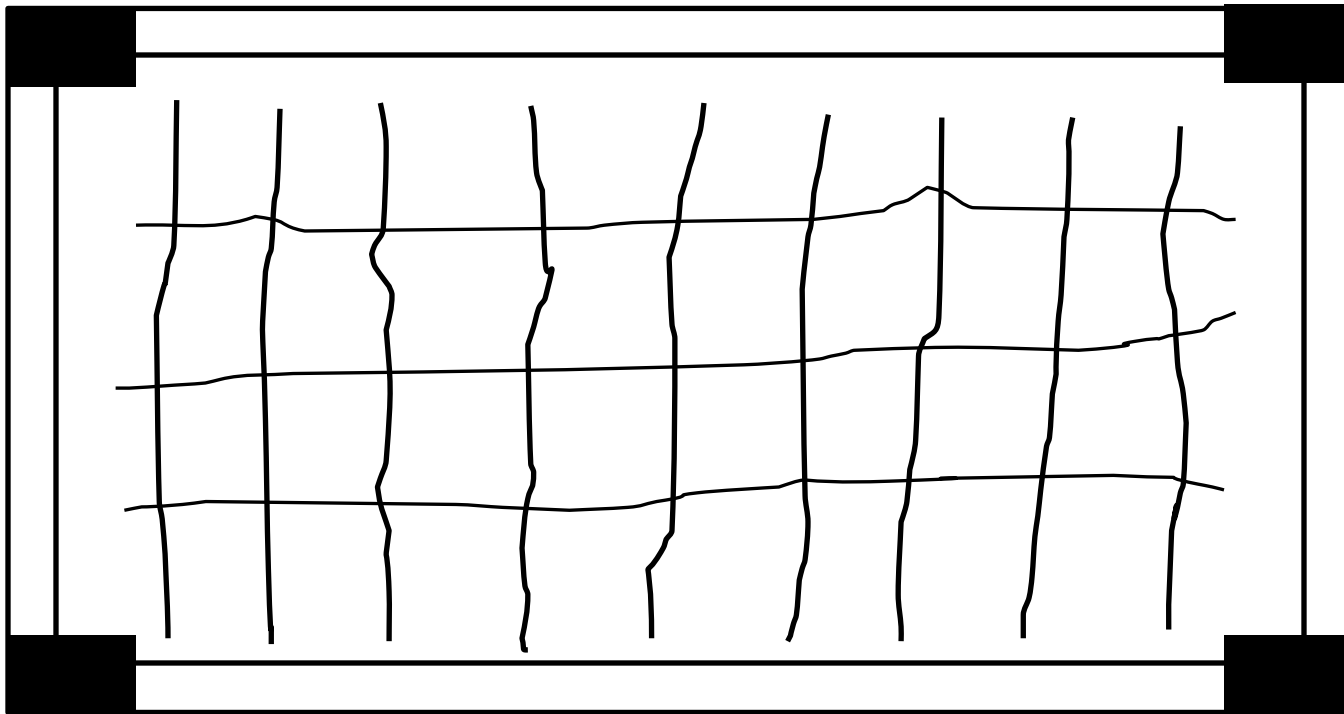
Spalling, cracking and delamination of RC structures (adapted from [2]).
